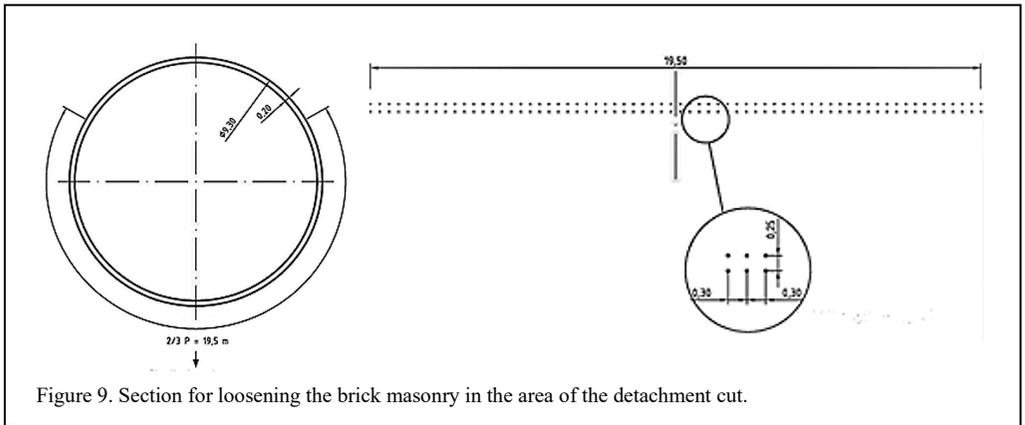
Section for loosening the brick masonry in the area of the detachment cut.
